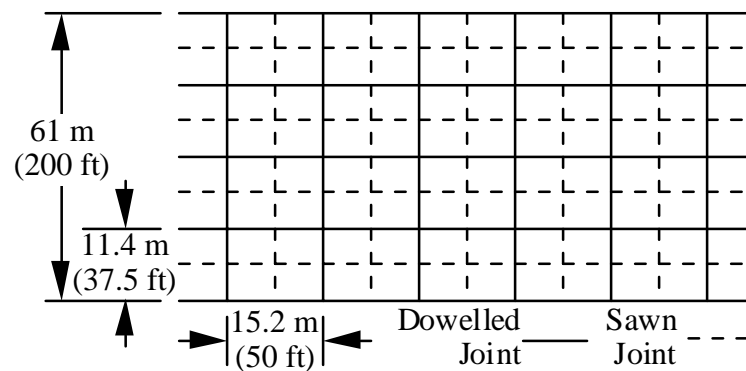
Plan View of Typical Section of New Runway at DFW International Airport
